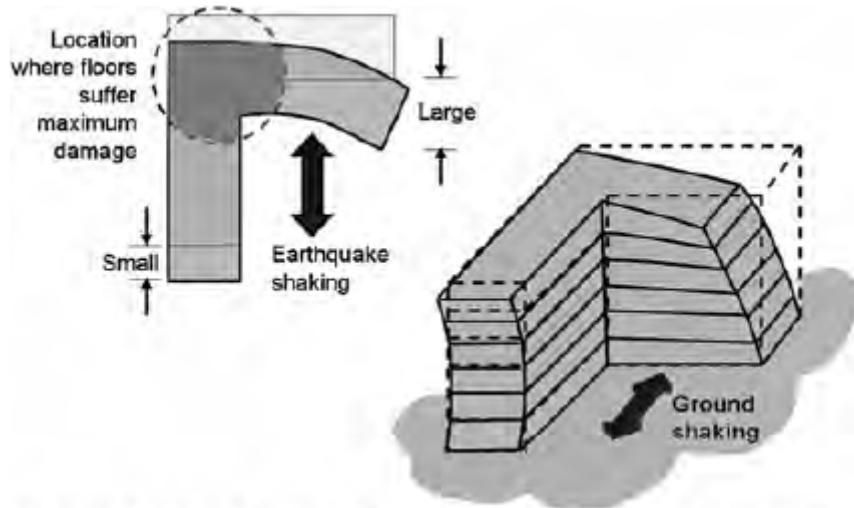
Poor earthquake behaviour of buildings with re-entrant corners
